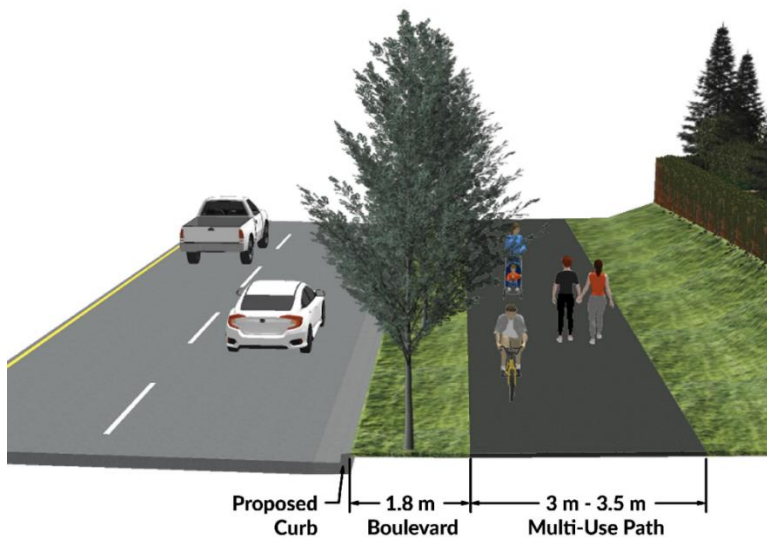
Multi-Use Path Concept between Albert Street and Queens Street
